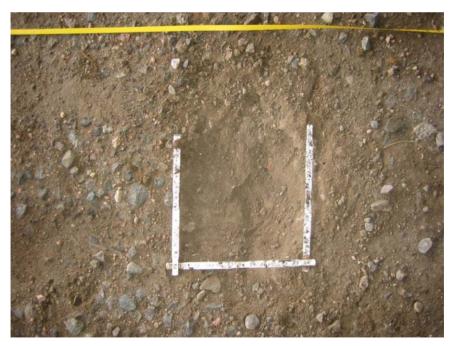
Soil sampling at the toe of ballasted tracks, under the Interstate Highway I-25.
